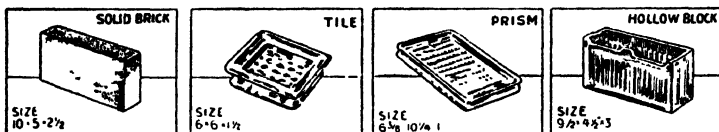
"Structural Glass" for Windows, Walls and Partitions
